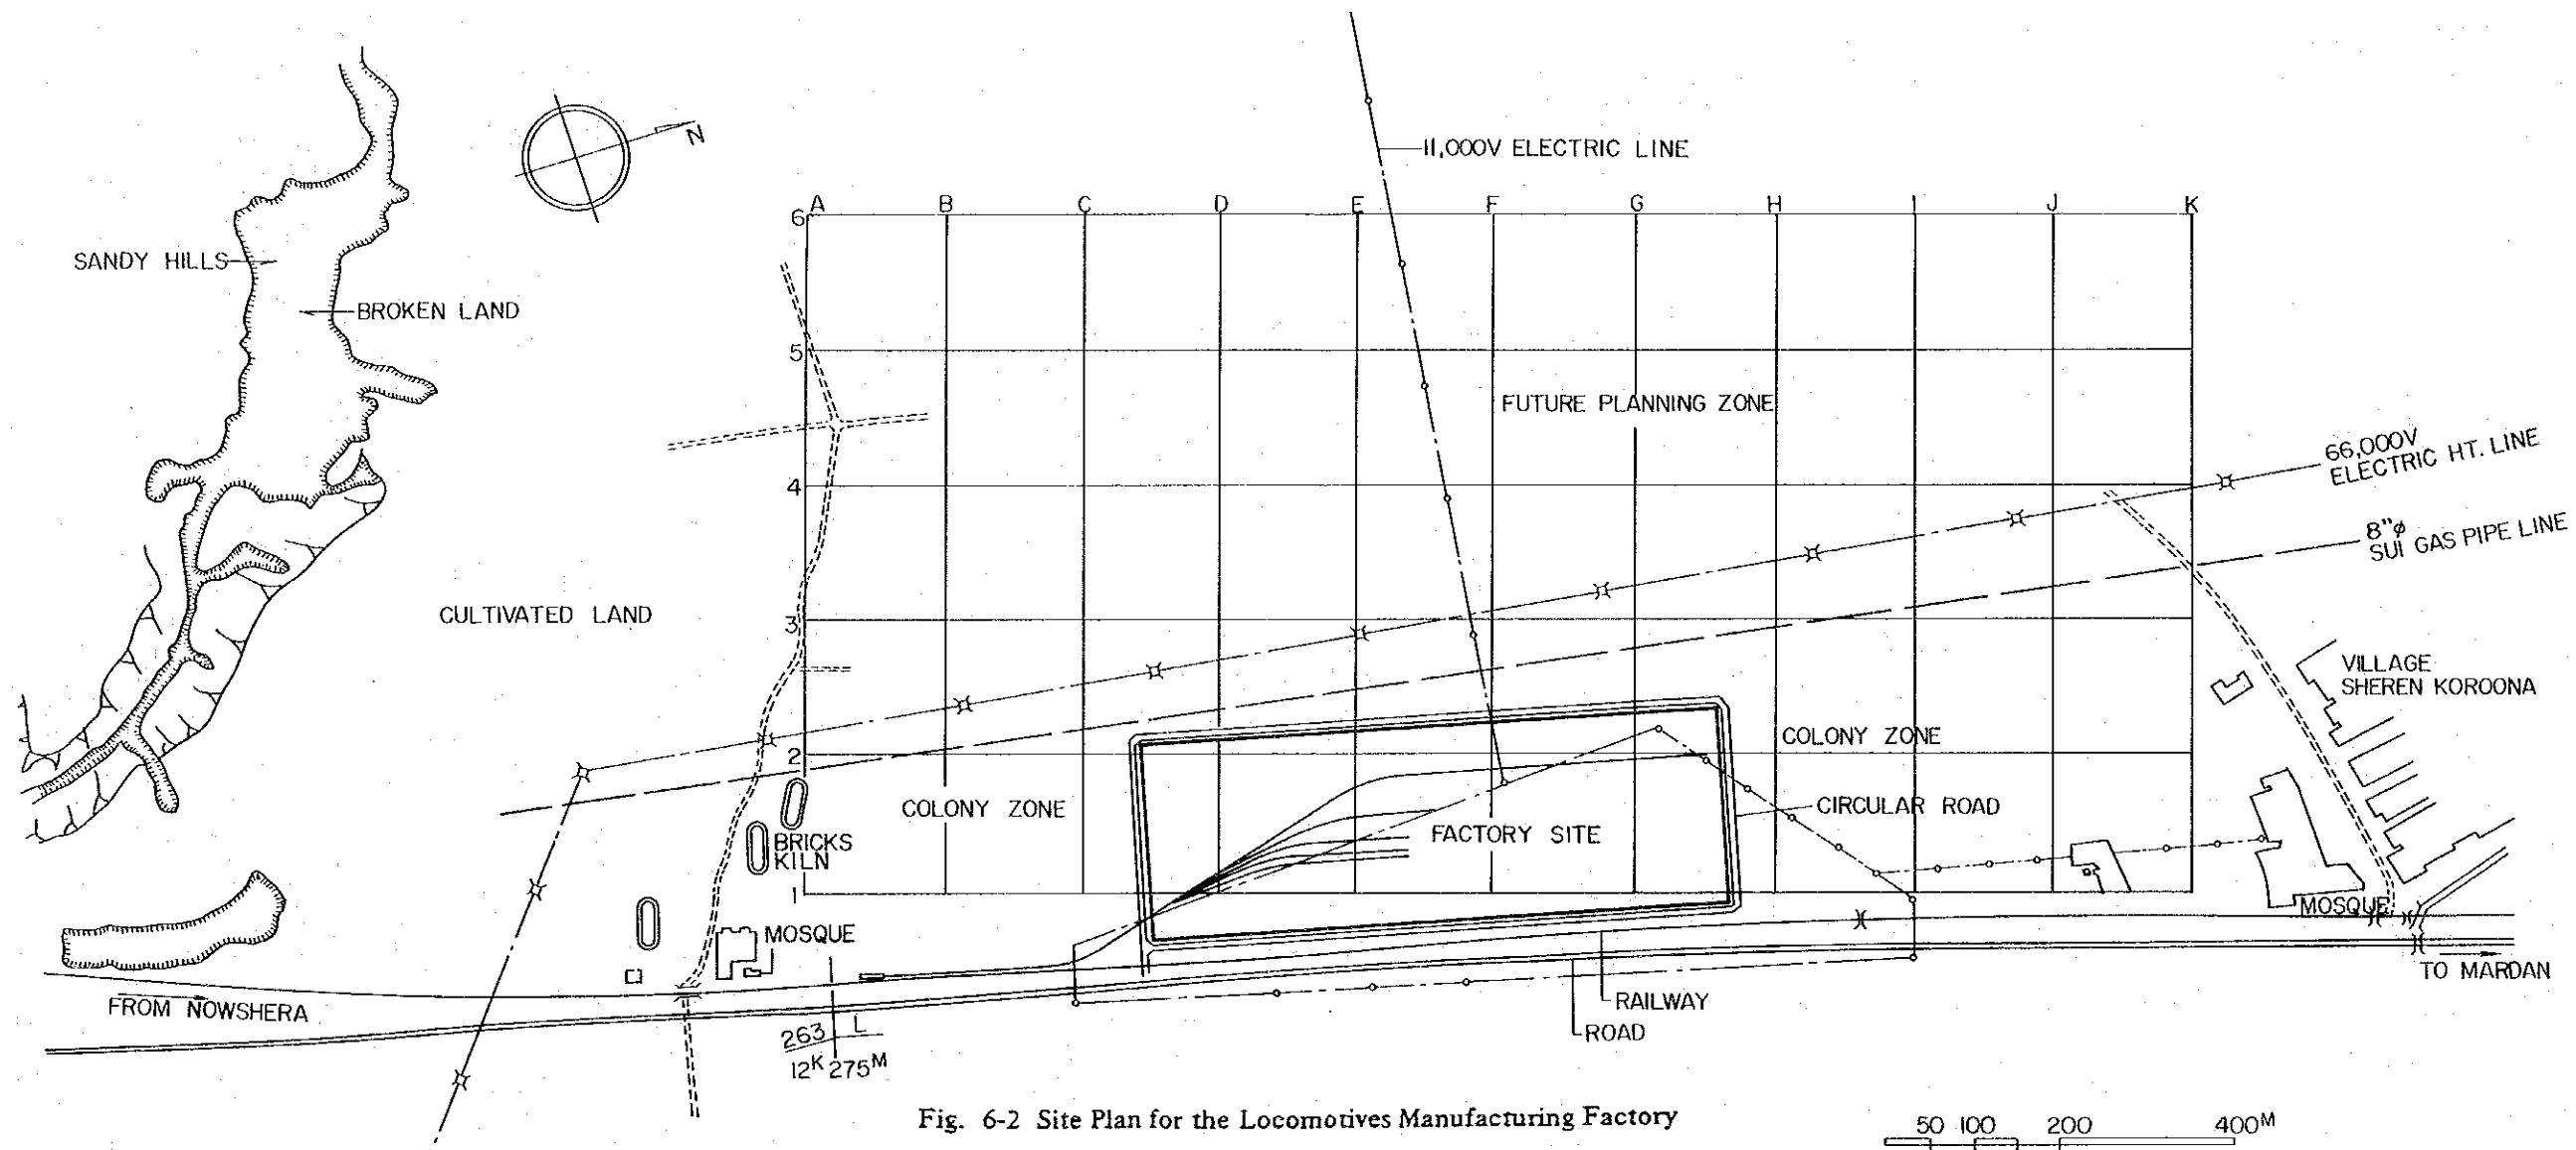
Site Plan for the Locomotives Manufacturing Factory
